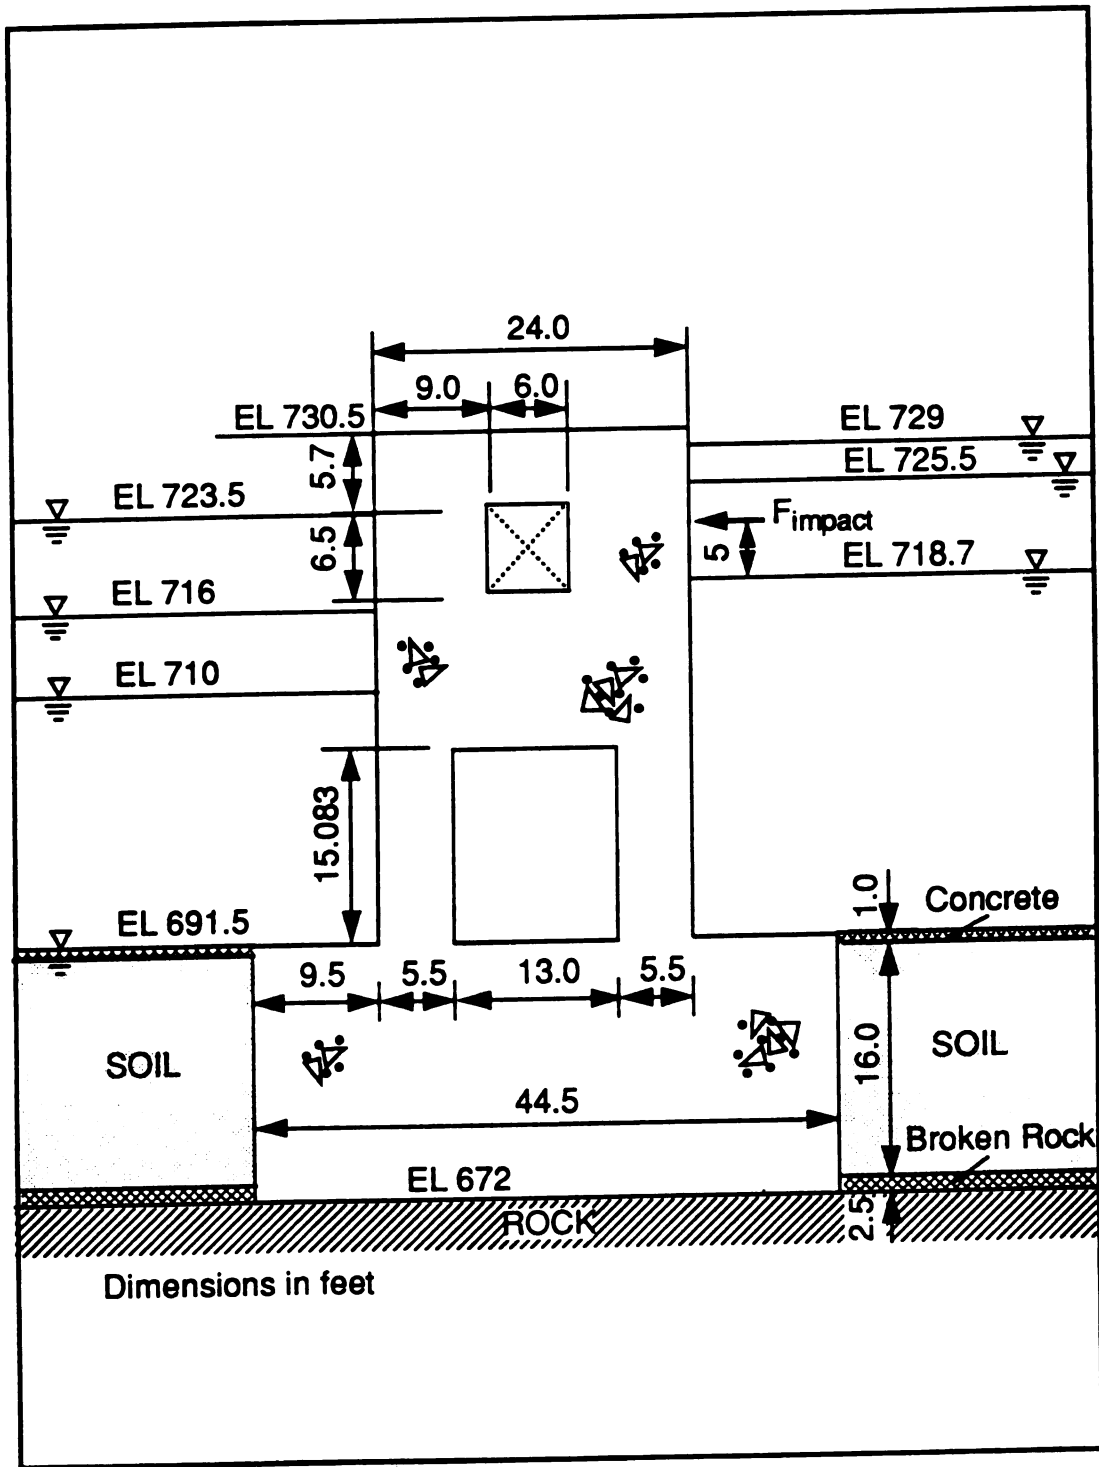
Locks & Dam No.2, Monolith M-16, Cross-Section
